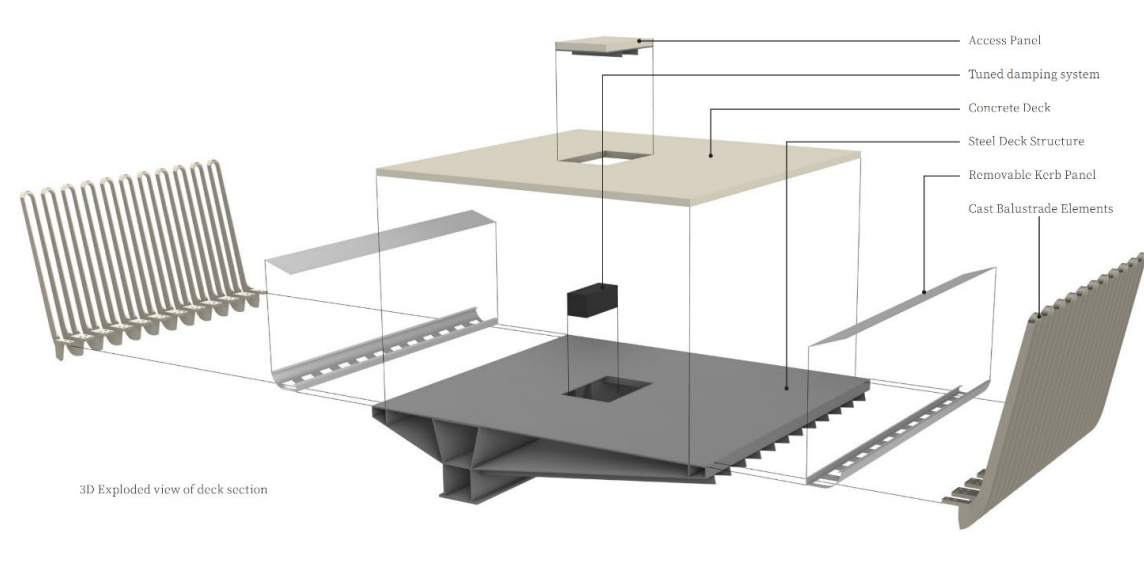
3D EXPLODED SECTIONAL VIEW OF CYCLEWAY DECK, SHOWING INDICATIVE FORM, ELEMENTS AND MATERIALS (SUBJECT TO DETAIL DESIGN)
